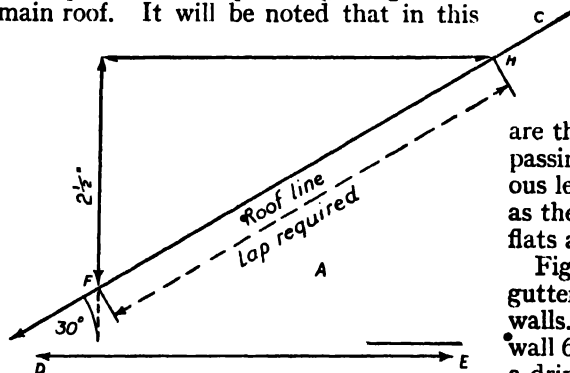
Calculating length of laps for lead covering on low-pitched roof (see text p. 639 for explanation).
